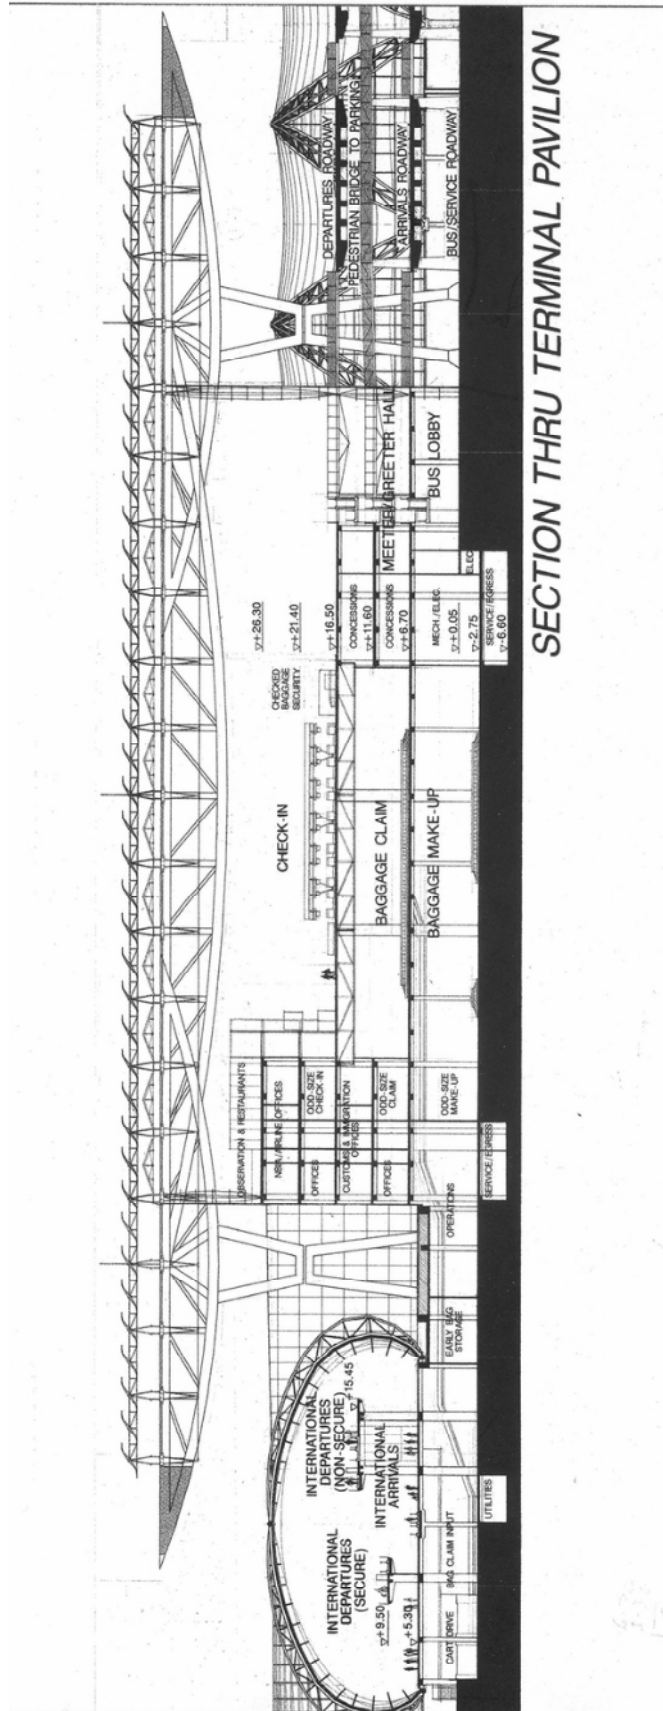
Floor Plan Suvarnabhoomi Airport
